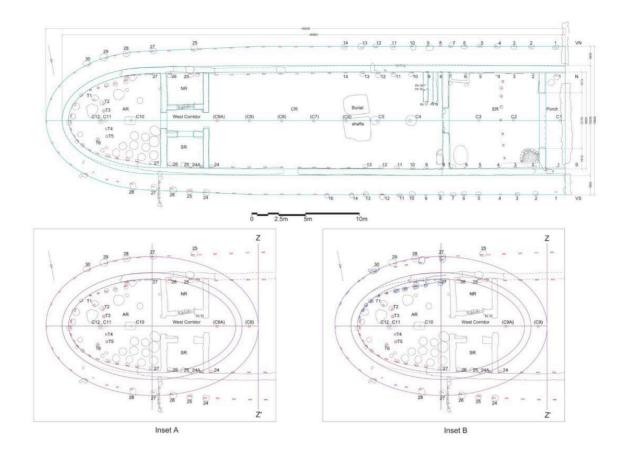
IDEALISED PLAN OF THE LK-T BUILDING (IN GREEN) SUPERIMPOSED ON THE EXISTING PLAN (IN BLACK). INSET A: A GEOMETRICALLY GENERATED TRIPLE-CONTOUR ELLIPSE (IN PURPLE) APPLIED ON THE APSIDAL END OF THE BUILDING. INSET B: THE OUTLINE OF THE WALL POSTS IN THE SOUTHERN HALF OF THE AR PROJECTED ONTO THE NORTHERN HALF OF THE AR (IN BLUE), RESULTING IN A LARGELY SYMMETRICAL PATTERN.
